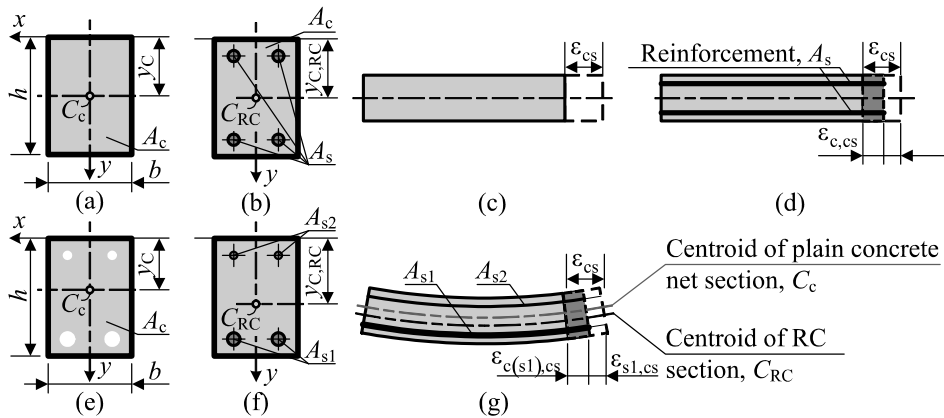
Deformations of concrete and RC members due to shrinkage: plain concrete section (a); symmetrical RC section (b); free shrinkage deformation (c); shrinkage-induced deformations in a symmetrically reinforced element (d); asymmetrical RC net section (e); asymmetrical RC section (f) and deformations in an asymmetrically reinforced element (g)
